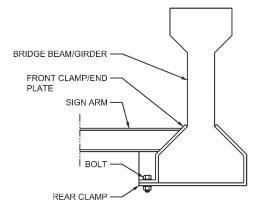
Attachment to Bridge Beam, Saddle Clamp
